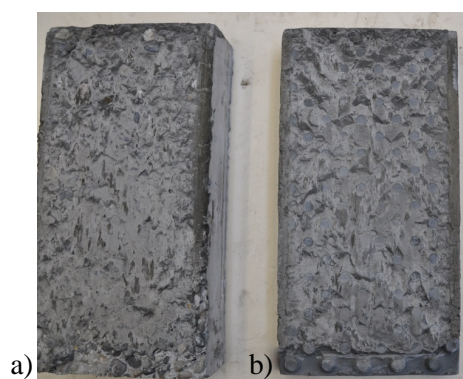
Shear failure* a) in roughened concrete-cement grout interface (specimen BR-C\_15) and b) in UHPFRC-cement grout interface (specimen BFUP-C\_9)
